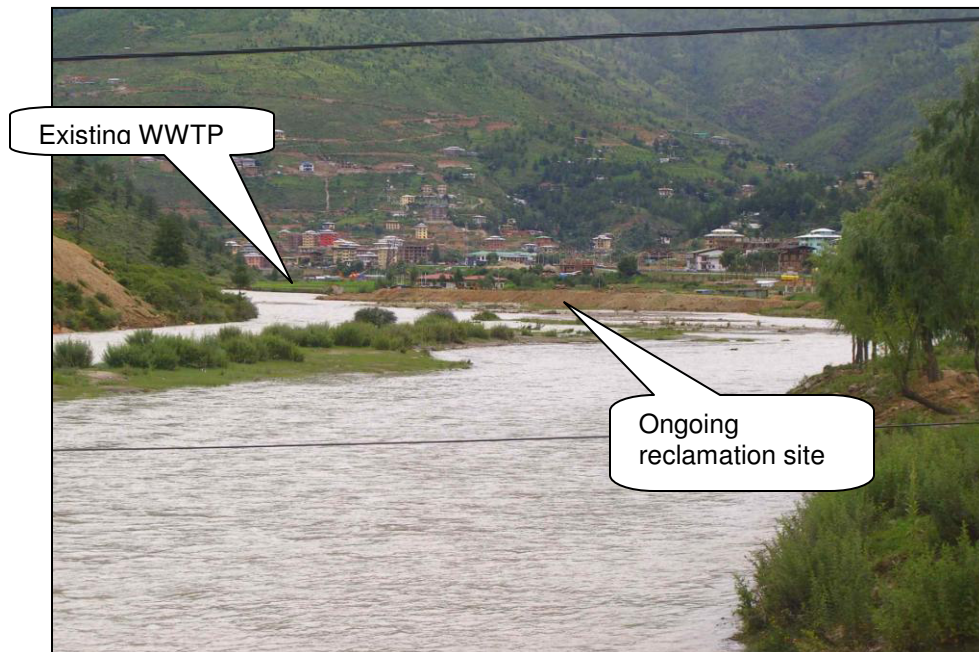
Existing and proposed WWTP site showing the ongoing reclamation area as seen from downstream of Wang Chhu
